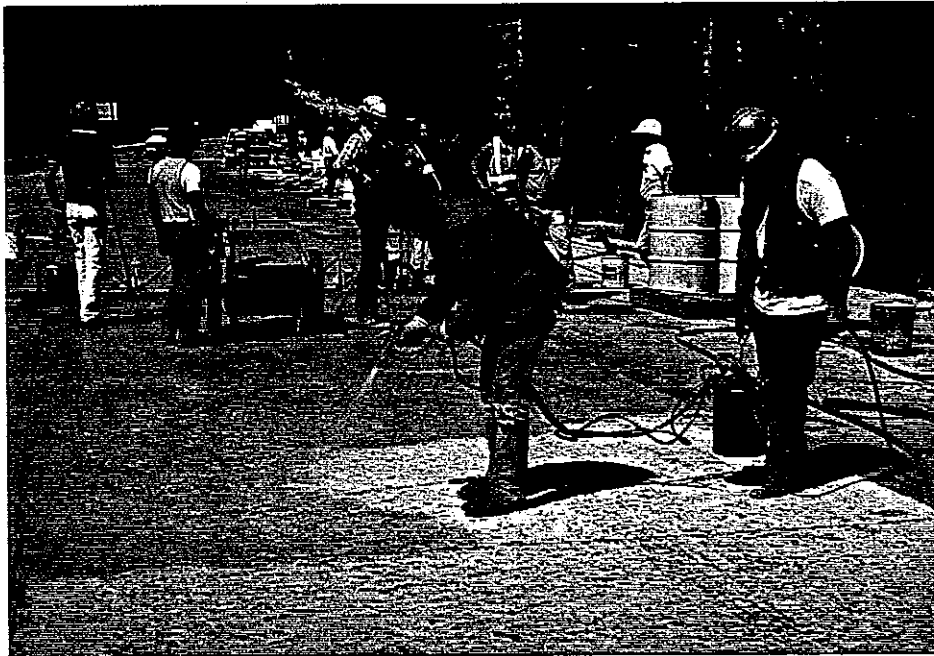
Application of polyester resin prime coat on sand blasted PCC pavement.
